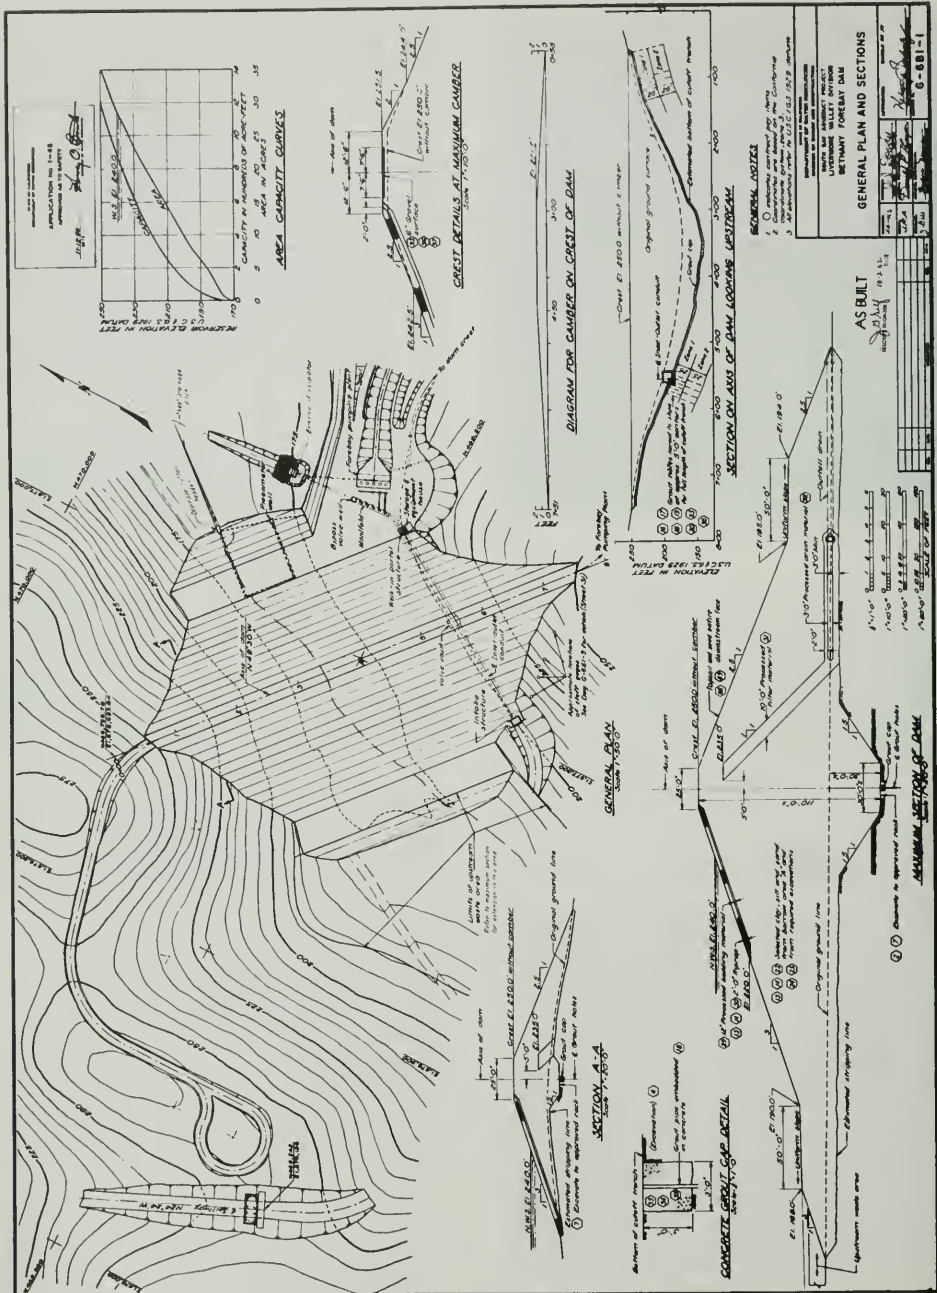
Bethany Forebay Dam—Plan, Profile, and Sections
